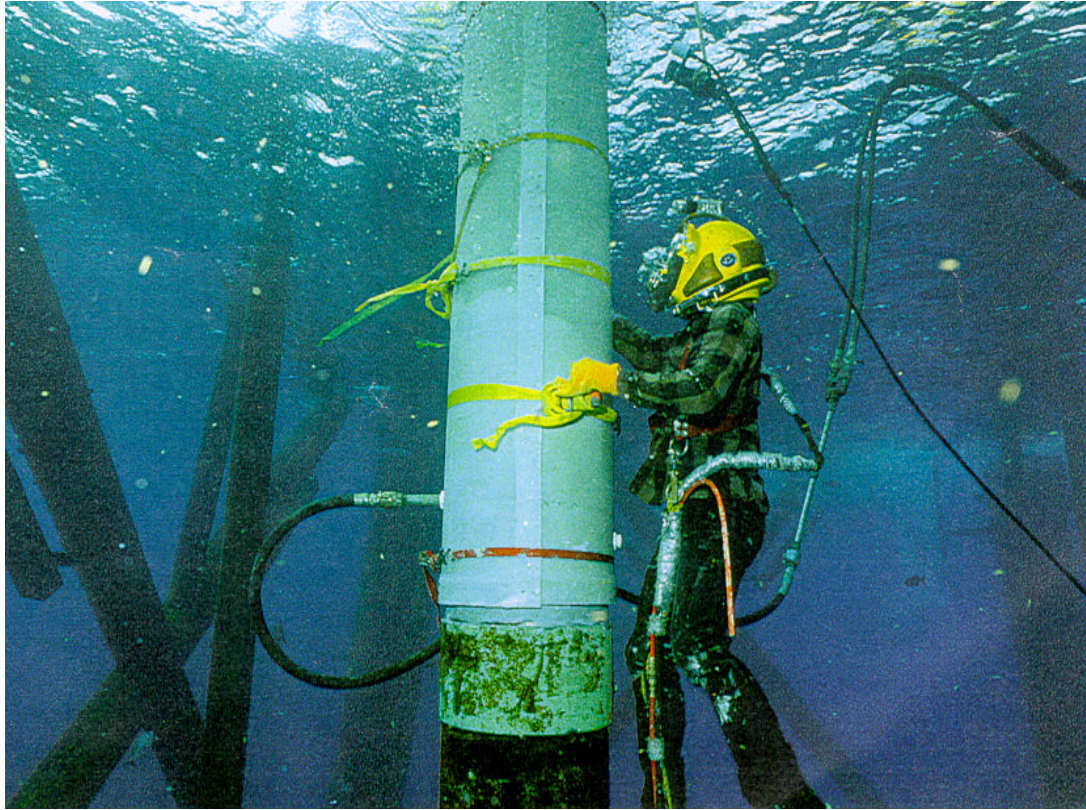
Underwater Encapsulation of a Translucent Epoxy Grouted Jacket
